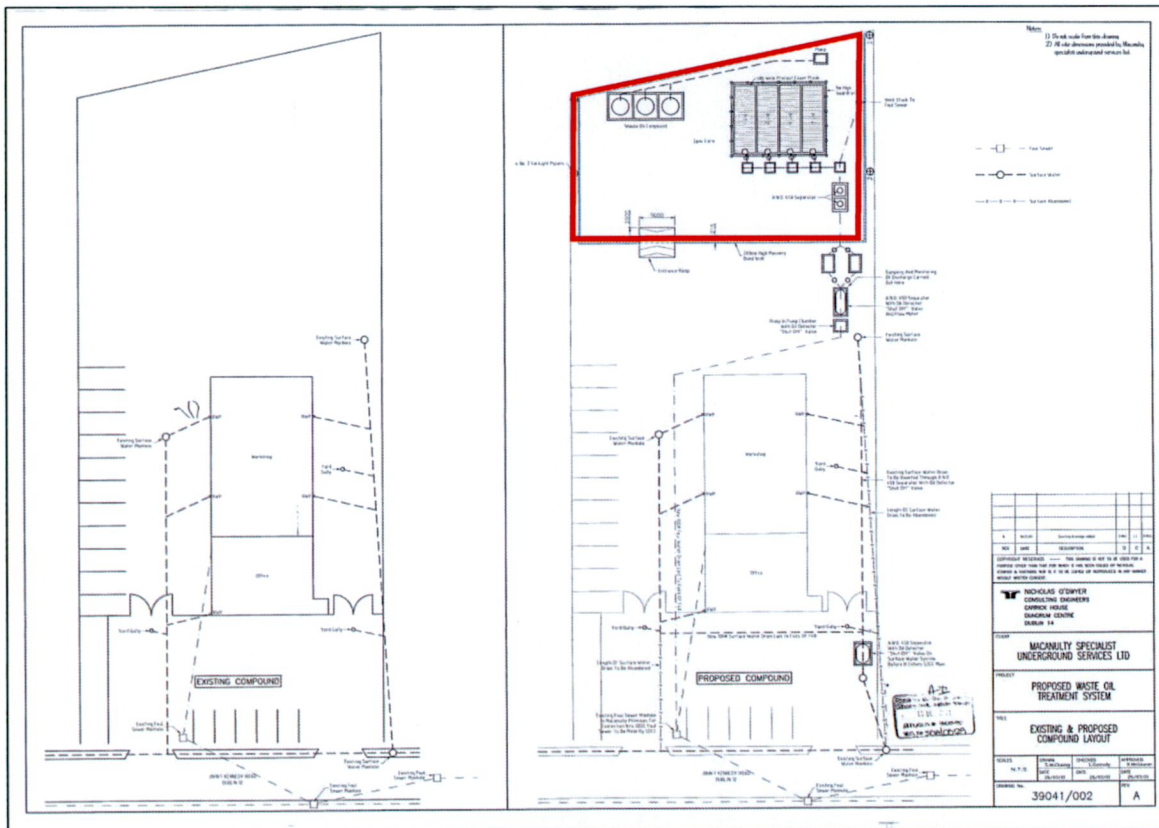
Proposed Layout of Concrete Tank (Area of Works Outlined Indicatively in Red)
